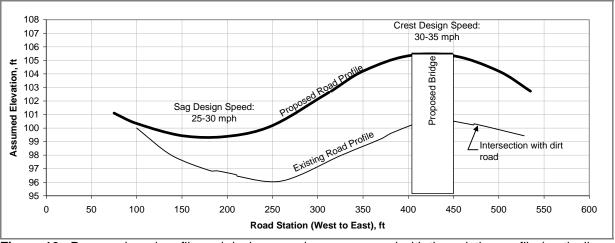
Proposed road profile and design speeds, as compared with the existing profile (vertically exaggerated).
